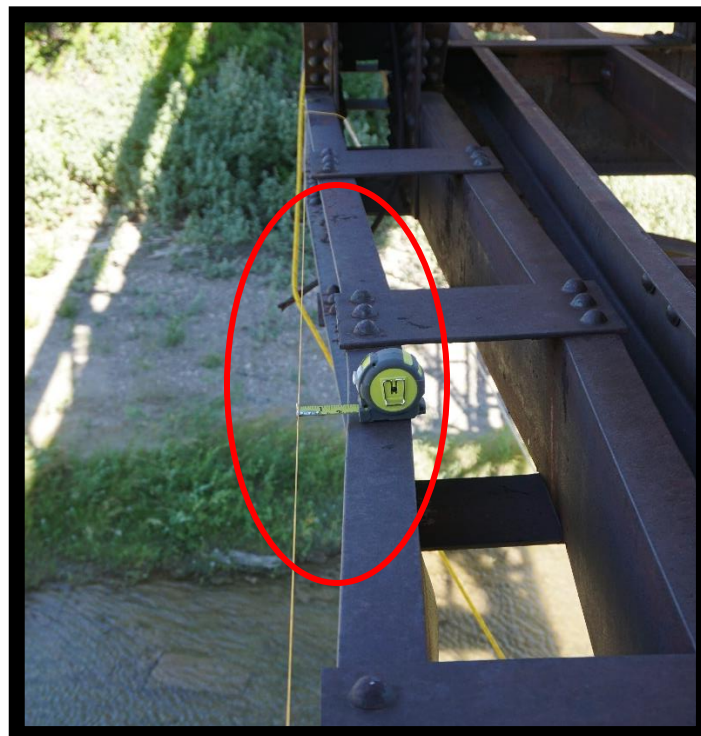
L2B to L1B Member. The straight-line deflection measured 2-3/8 to 2-1/2 inches.
